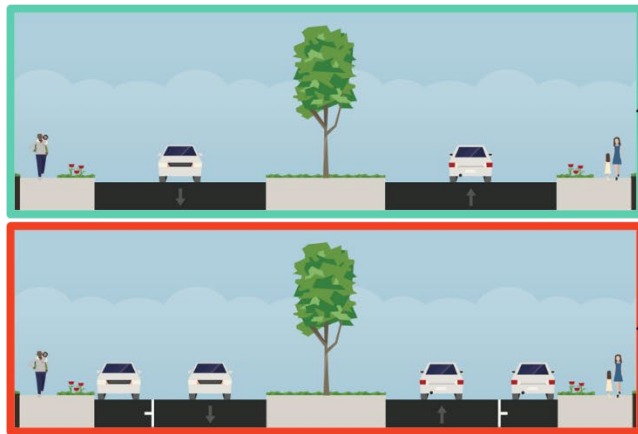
Edsall Road looking west toward Yoakum Parkway.
